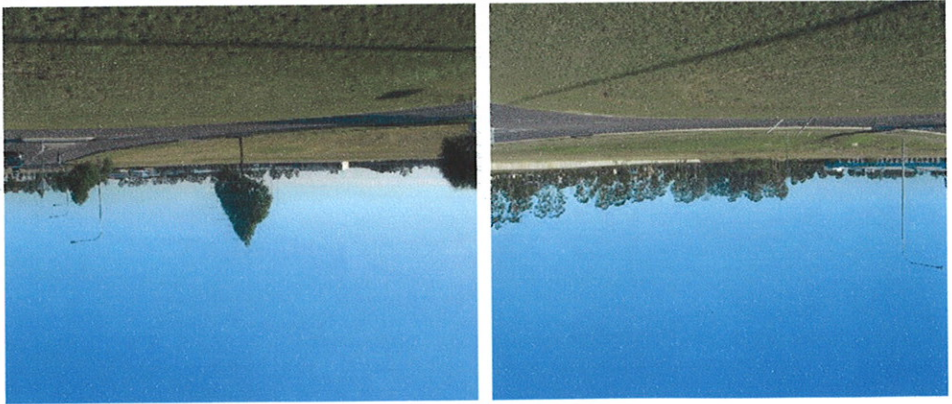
North-eastern view of the site. Roundabout and Beech Road in the foreground.
